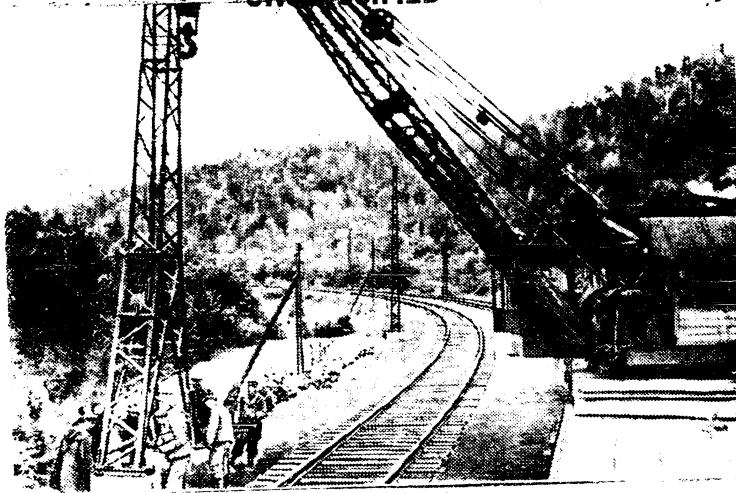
The installation of an anker tower on the Vavilovo - Min'yar stretch.
